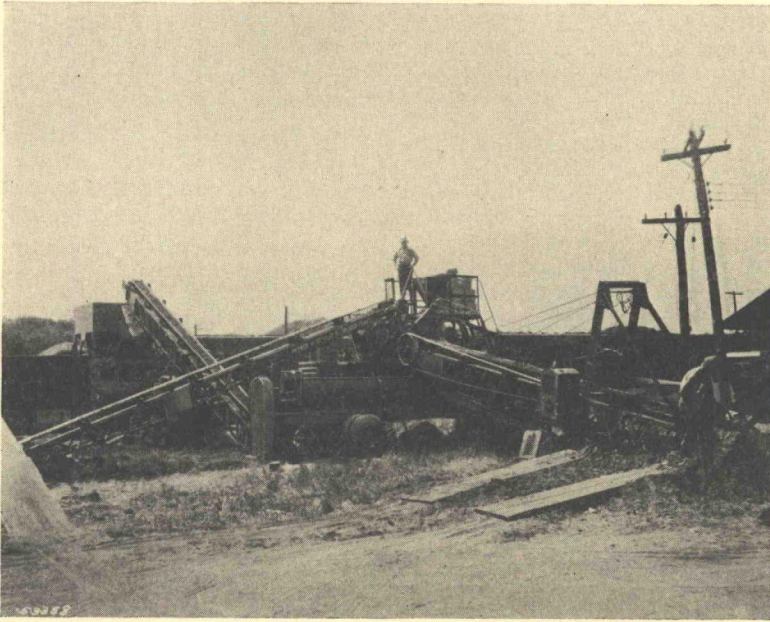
Portable Stabilization Plant as Built by Pioneer Gravel Equipment Manufacturing Company, Minneapolis, Minnesota
